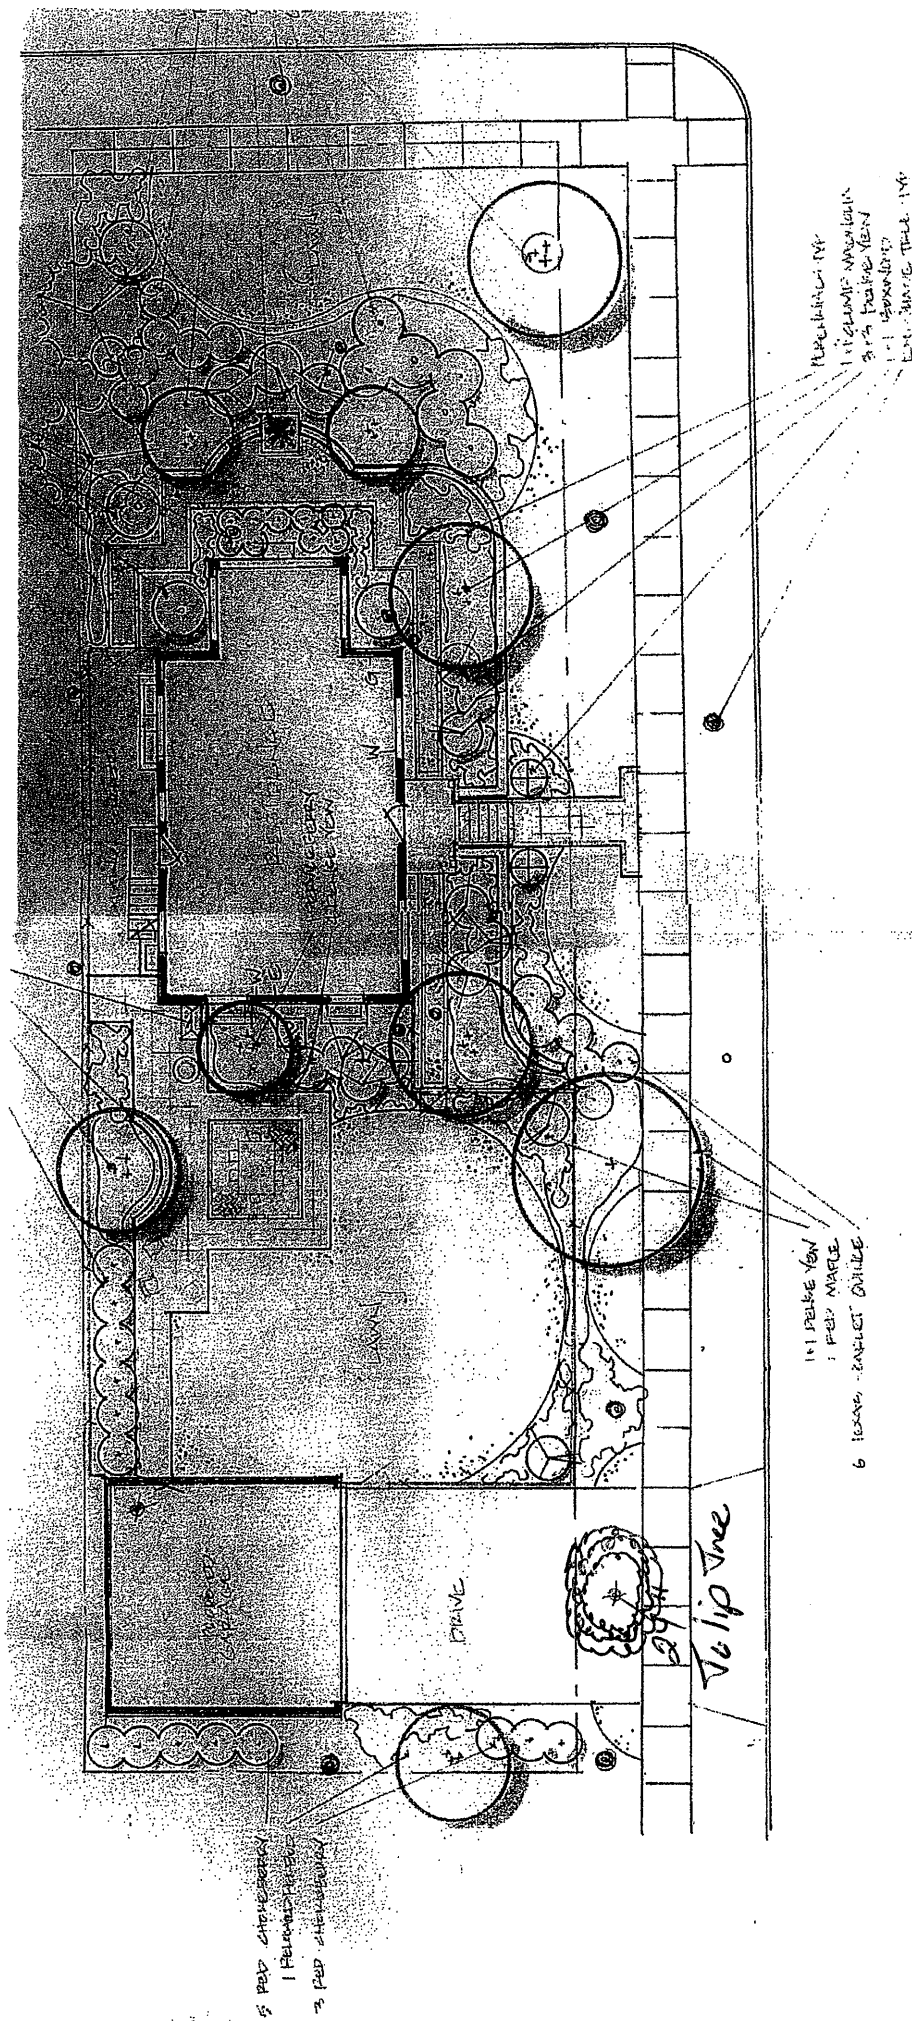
EXHIBIT A: CONCEPT GARAGE RELOCATION PLAN 105 N VINE ST.
